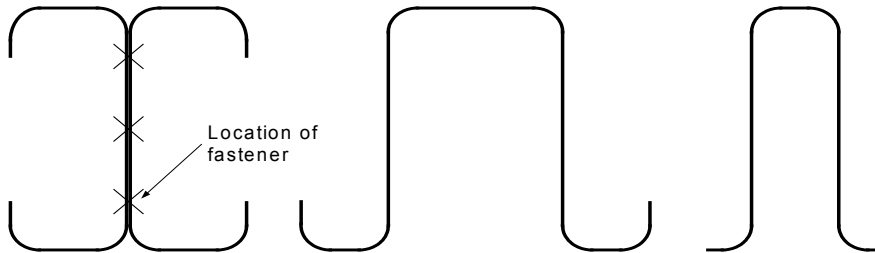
Examples of Sections Tested by Winter and Pian
